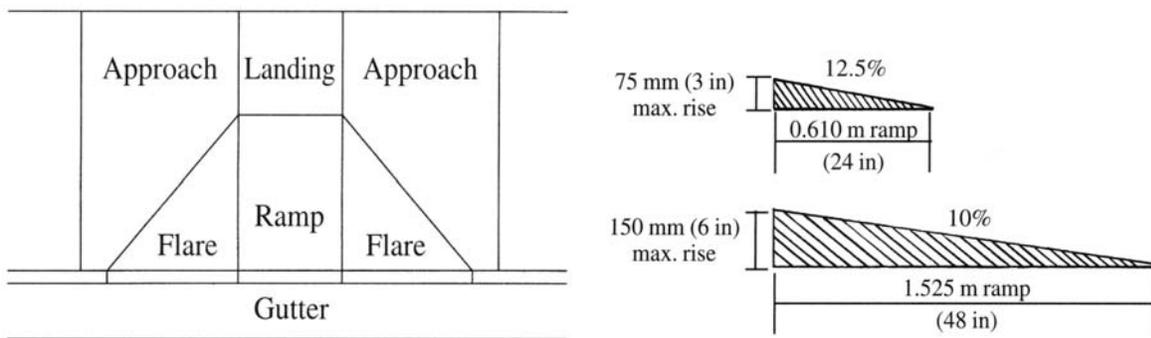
Curb Ramp Components, and Alternate Ramp Slopes
